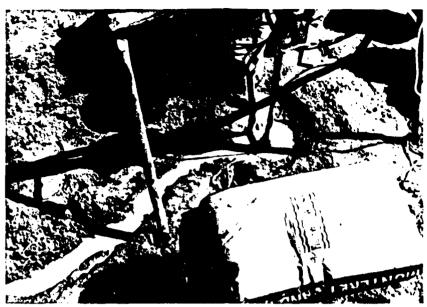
BACKFILLING THE BORING WITH MONTEREY NO. 1 SAND AFTER PROBE INSTALLATION
